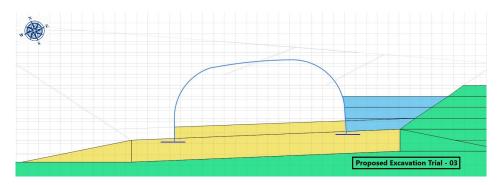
Plan view - Proposed Excavation - Trial 03
